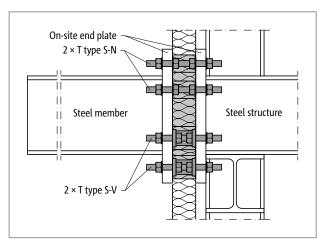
Schöck Isokorb® T type S for cantilevered steel structures
